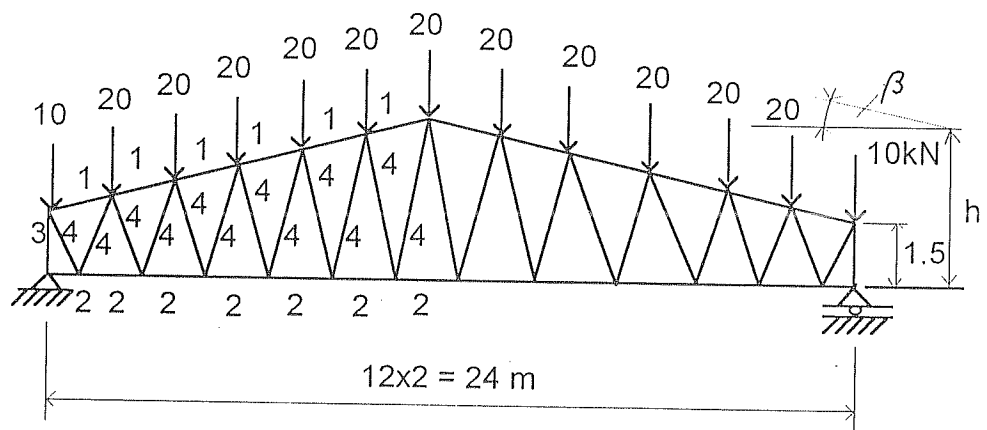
Numerical example of a roof truss. 1 - section for upper chord, 2 - section for lower chord, 3 - section for outside columns, 4 - section for braces. The height h varies with the slope angle β of the upper chord.
